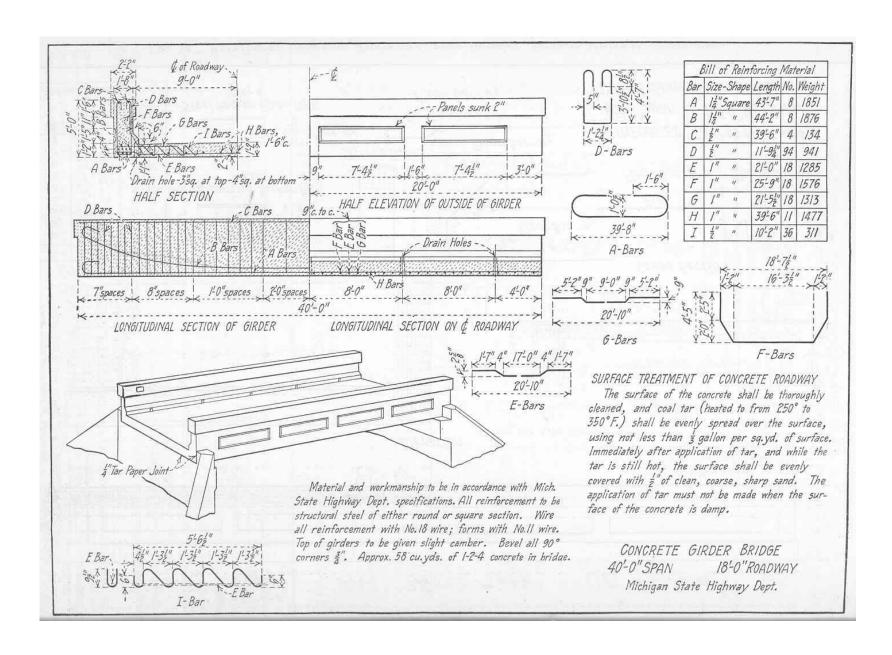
Reinforced Concrete Through-deck Girder Bridge.
